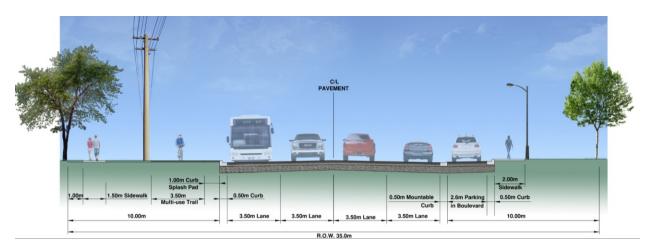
Typical Cross Section - In-Boulevard Parking on the South Side
